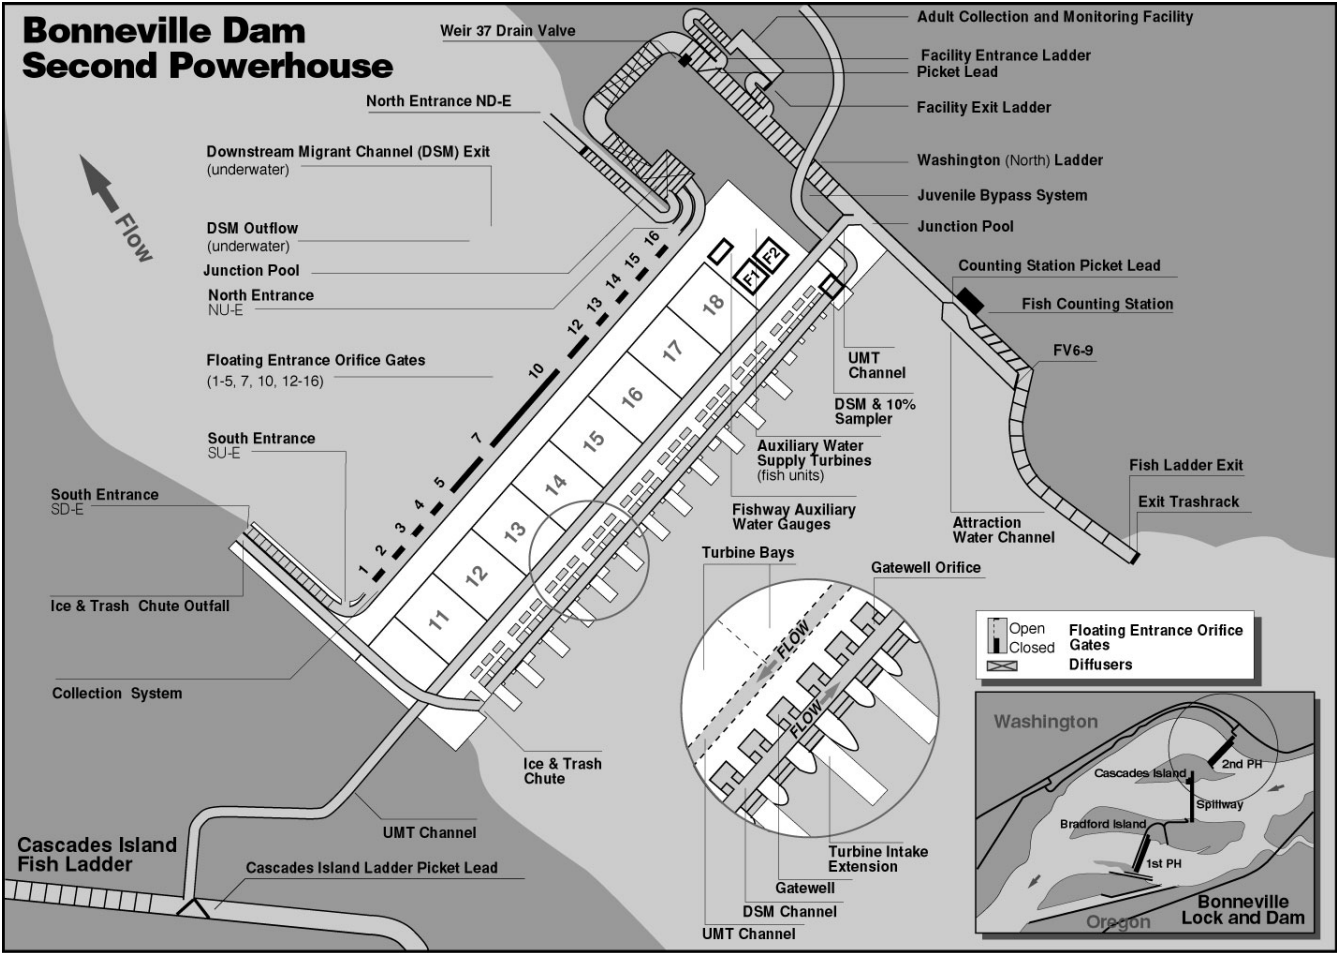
Bonneville Dam second powerhouse and Washington (north) fish ladder.
